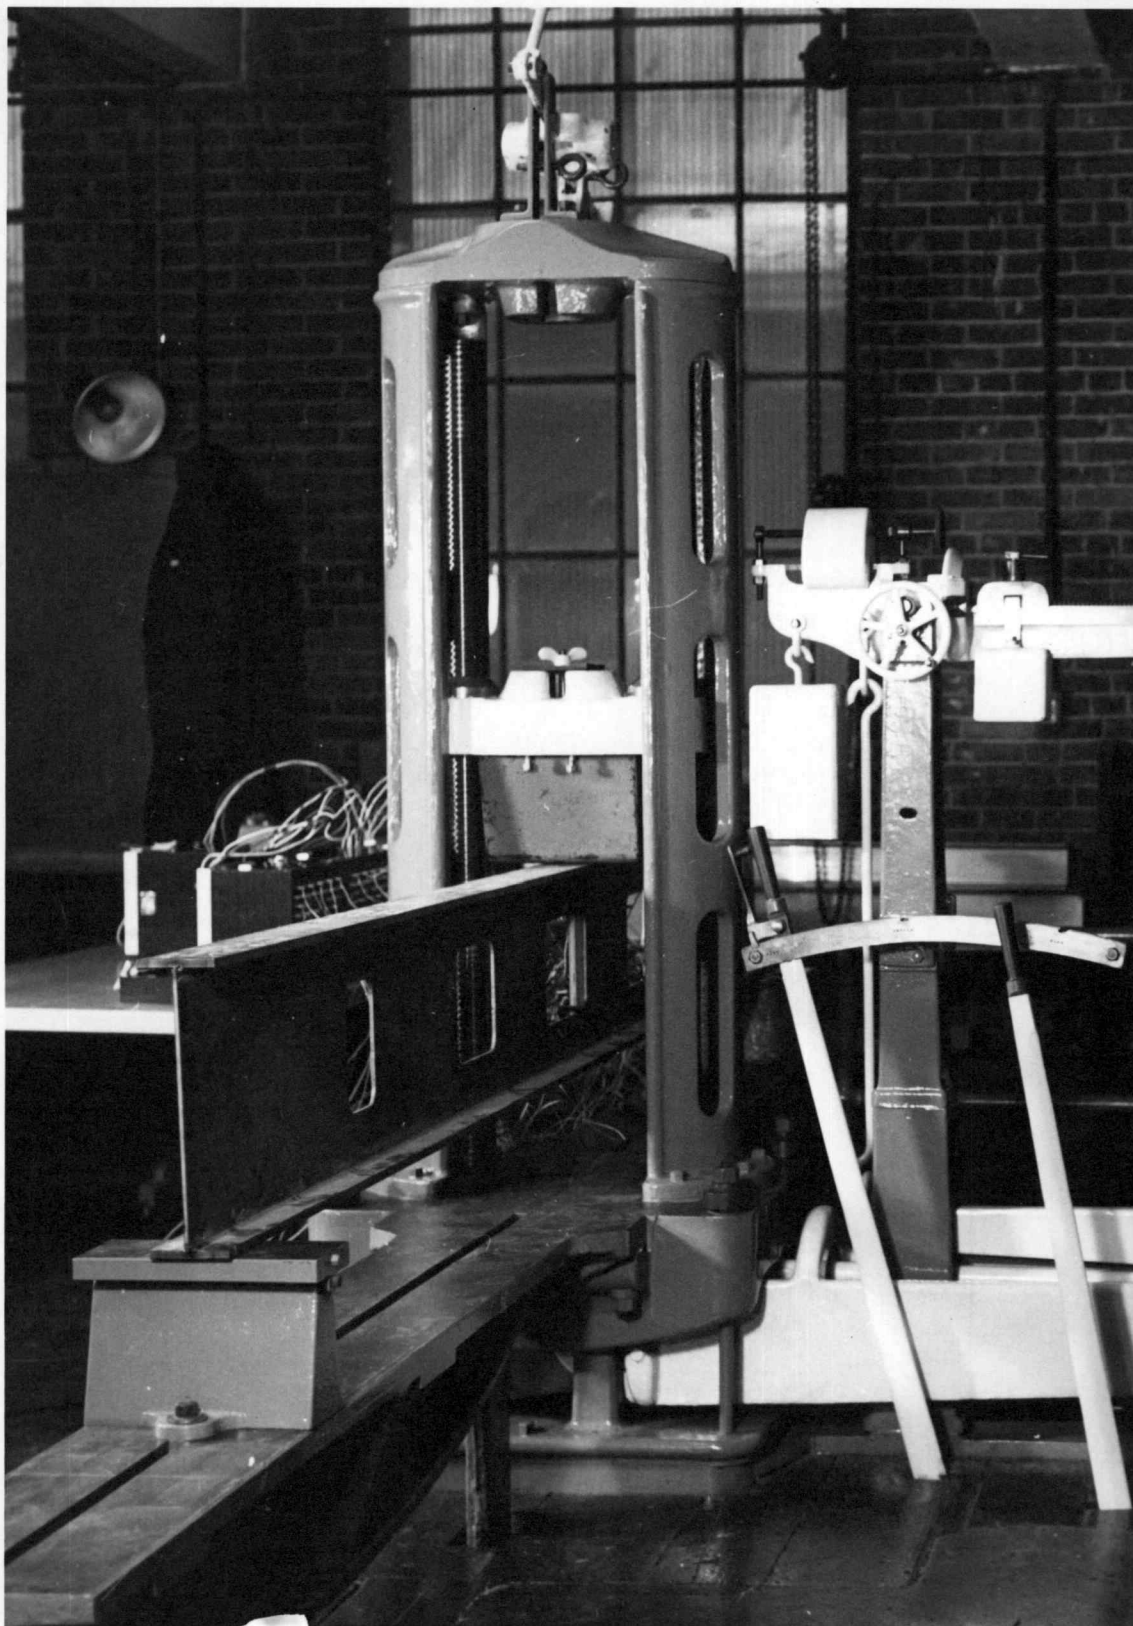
Beam with holes in position in Rhiele Testing Machine.
